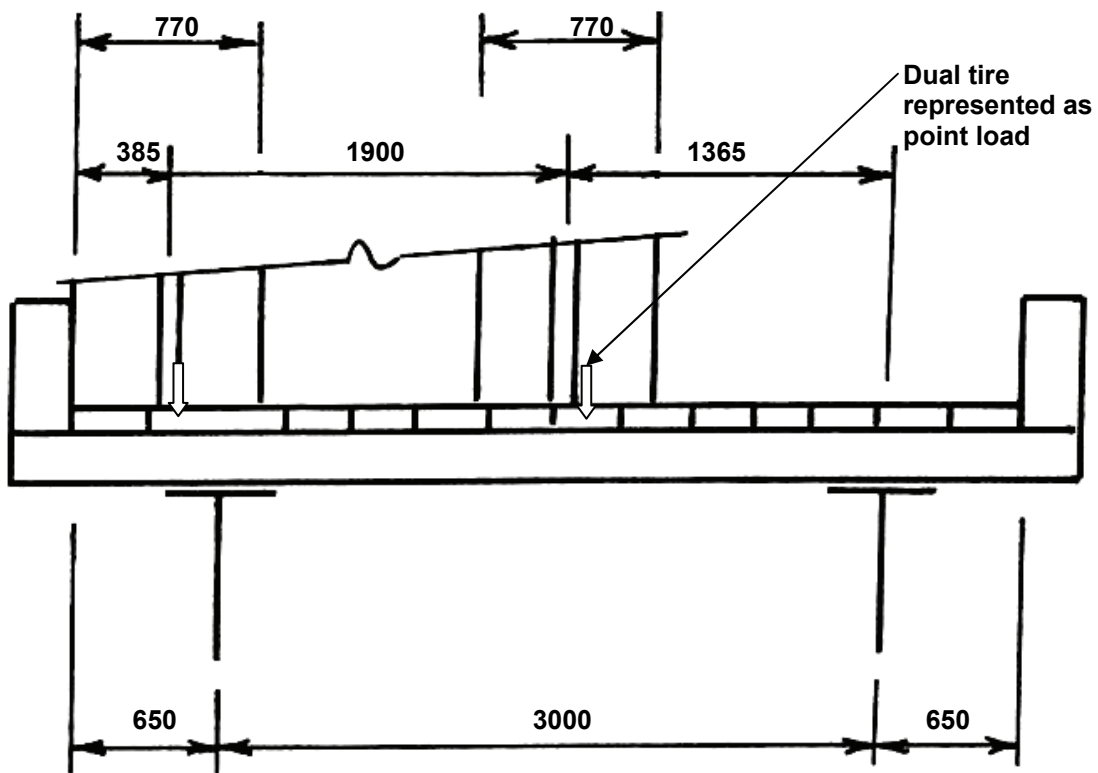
Transverse position of Light Off-highway Design Truck on timber deck on girders at a spacing of 3.0 m
